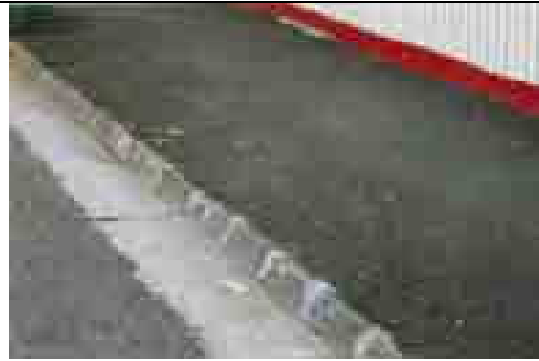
Bluestone kerb and concrete channel, Clarence Street. Source: David Rowe, 2001.
